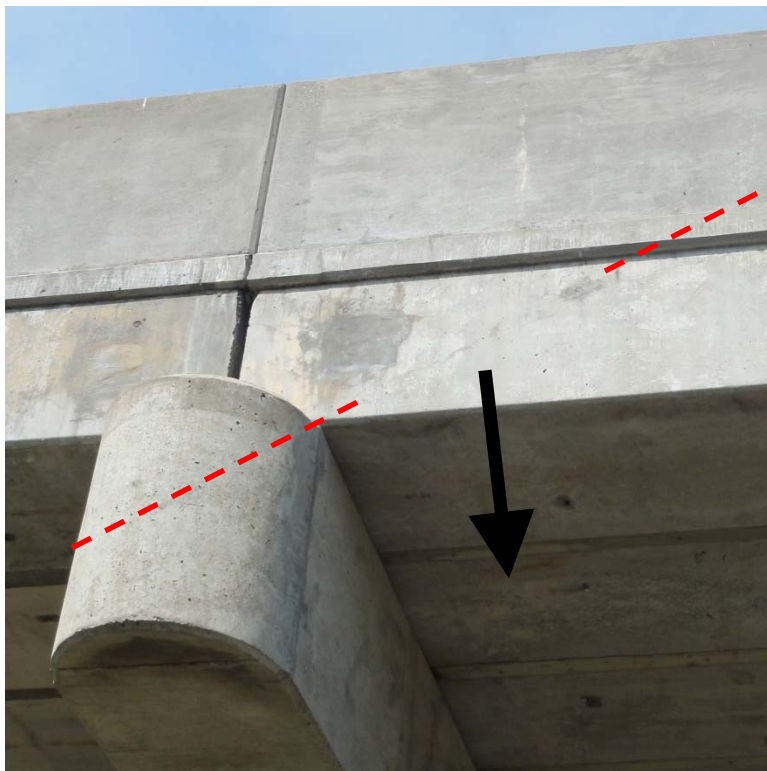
Photograph of fascia beam on box-beam bridge with thin, 45-degree crack near top of pier and post-tension box
